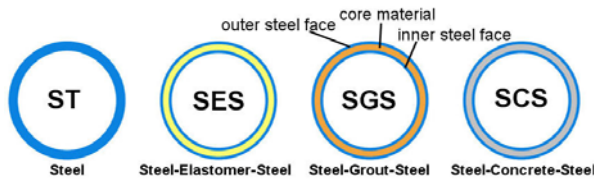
Sandwich shells with a core material as full space stiffener for tower sections of WEC
